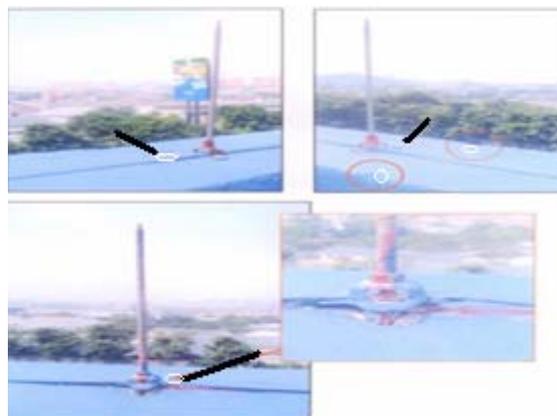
Arrows pointing to marks of missed capturing on building parapet wall.
